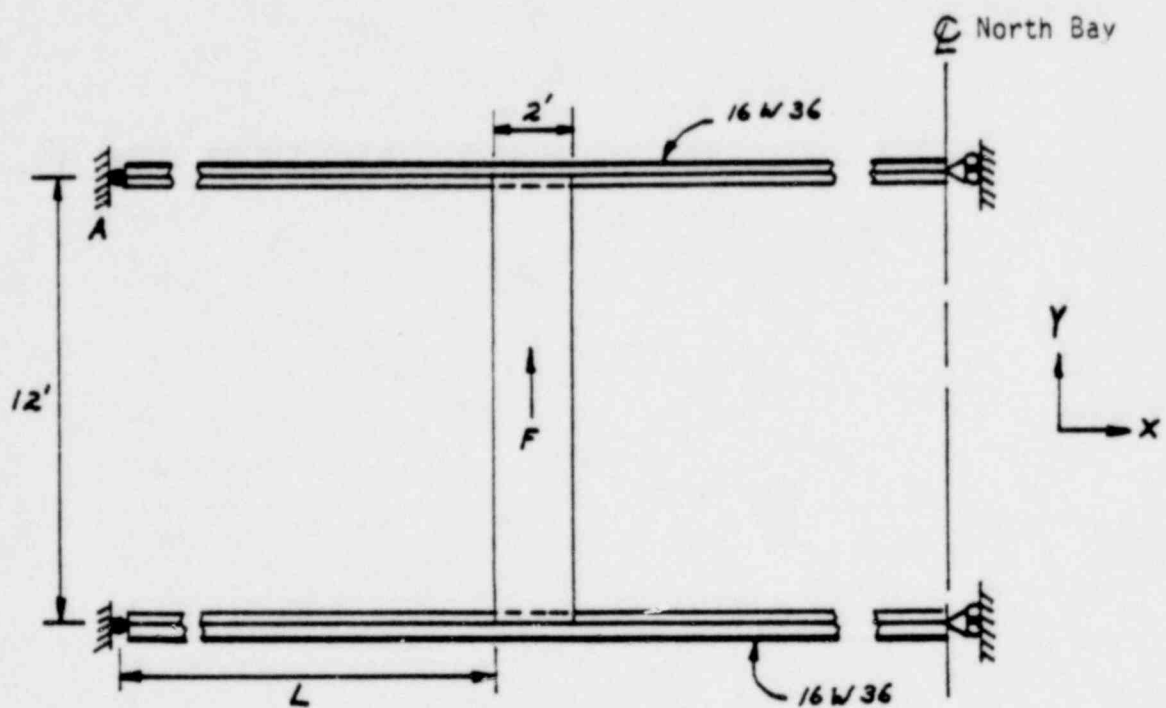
SINGLE CHANNEL SLAB ON THE STEEL FRAMING
